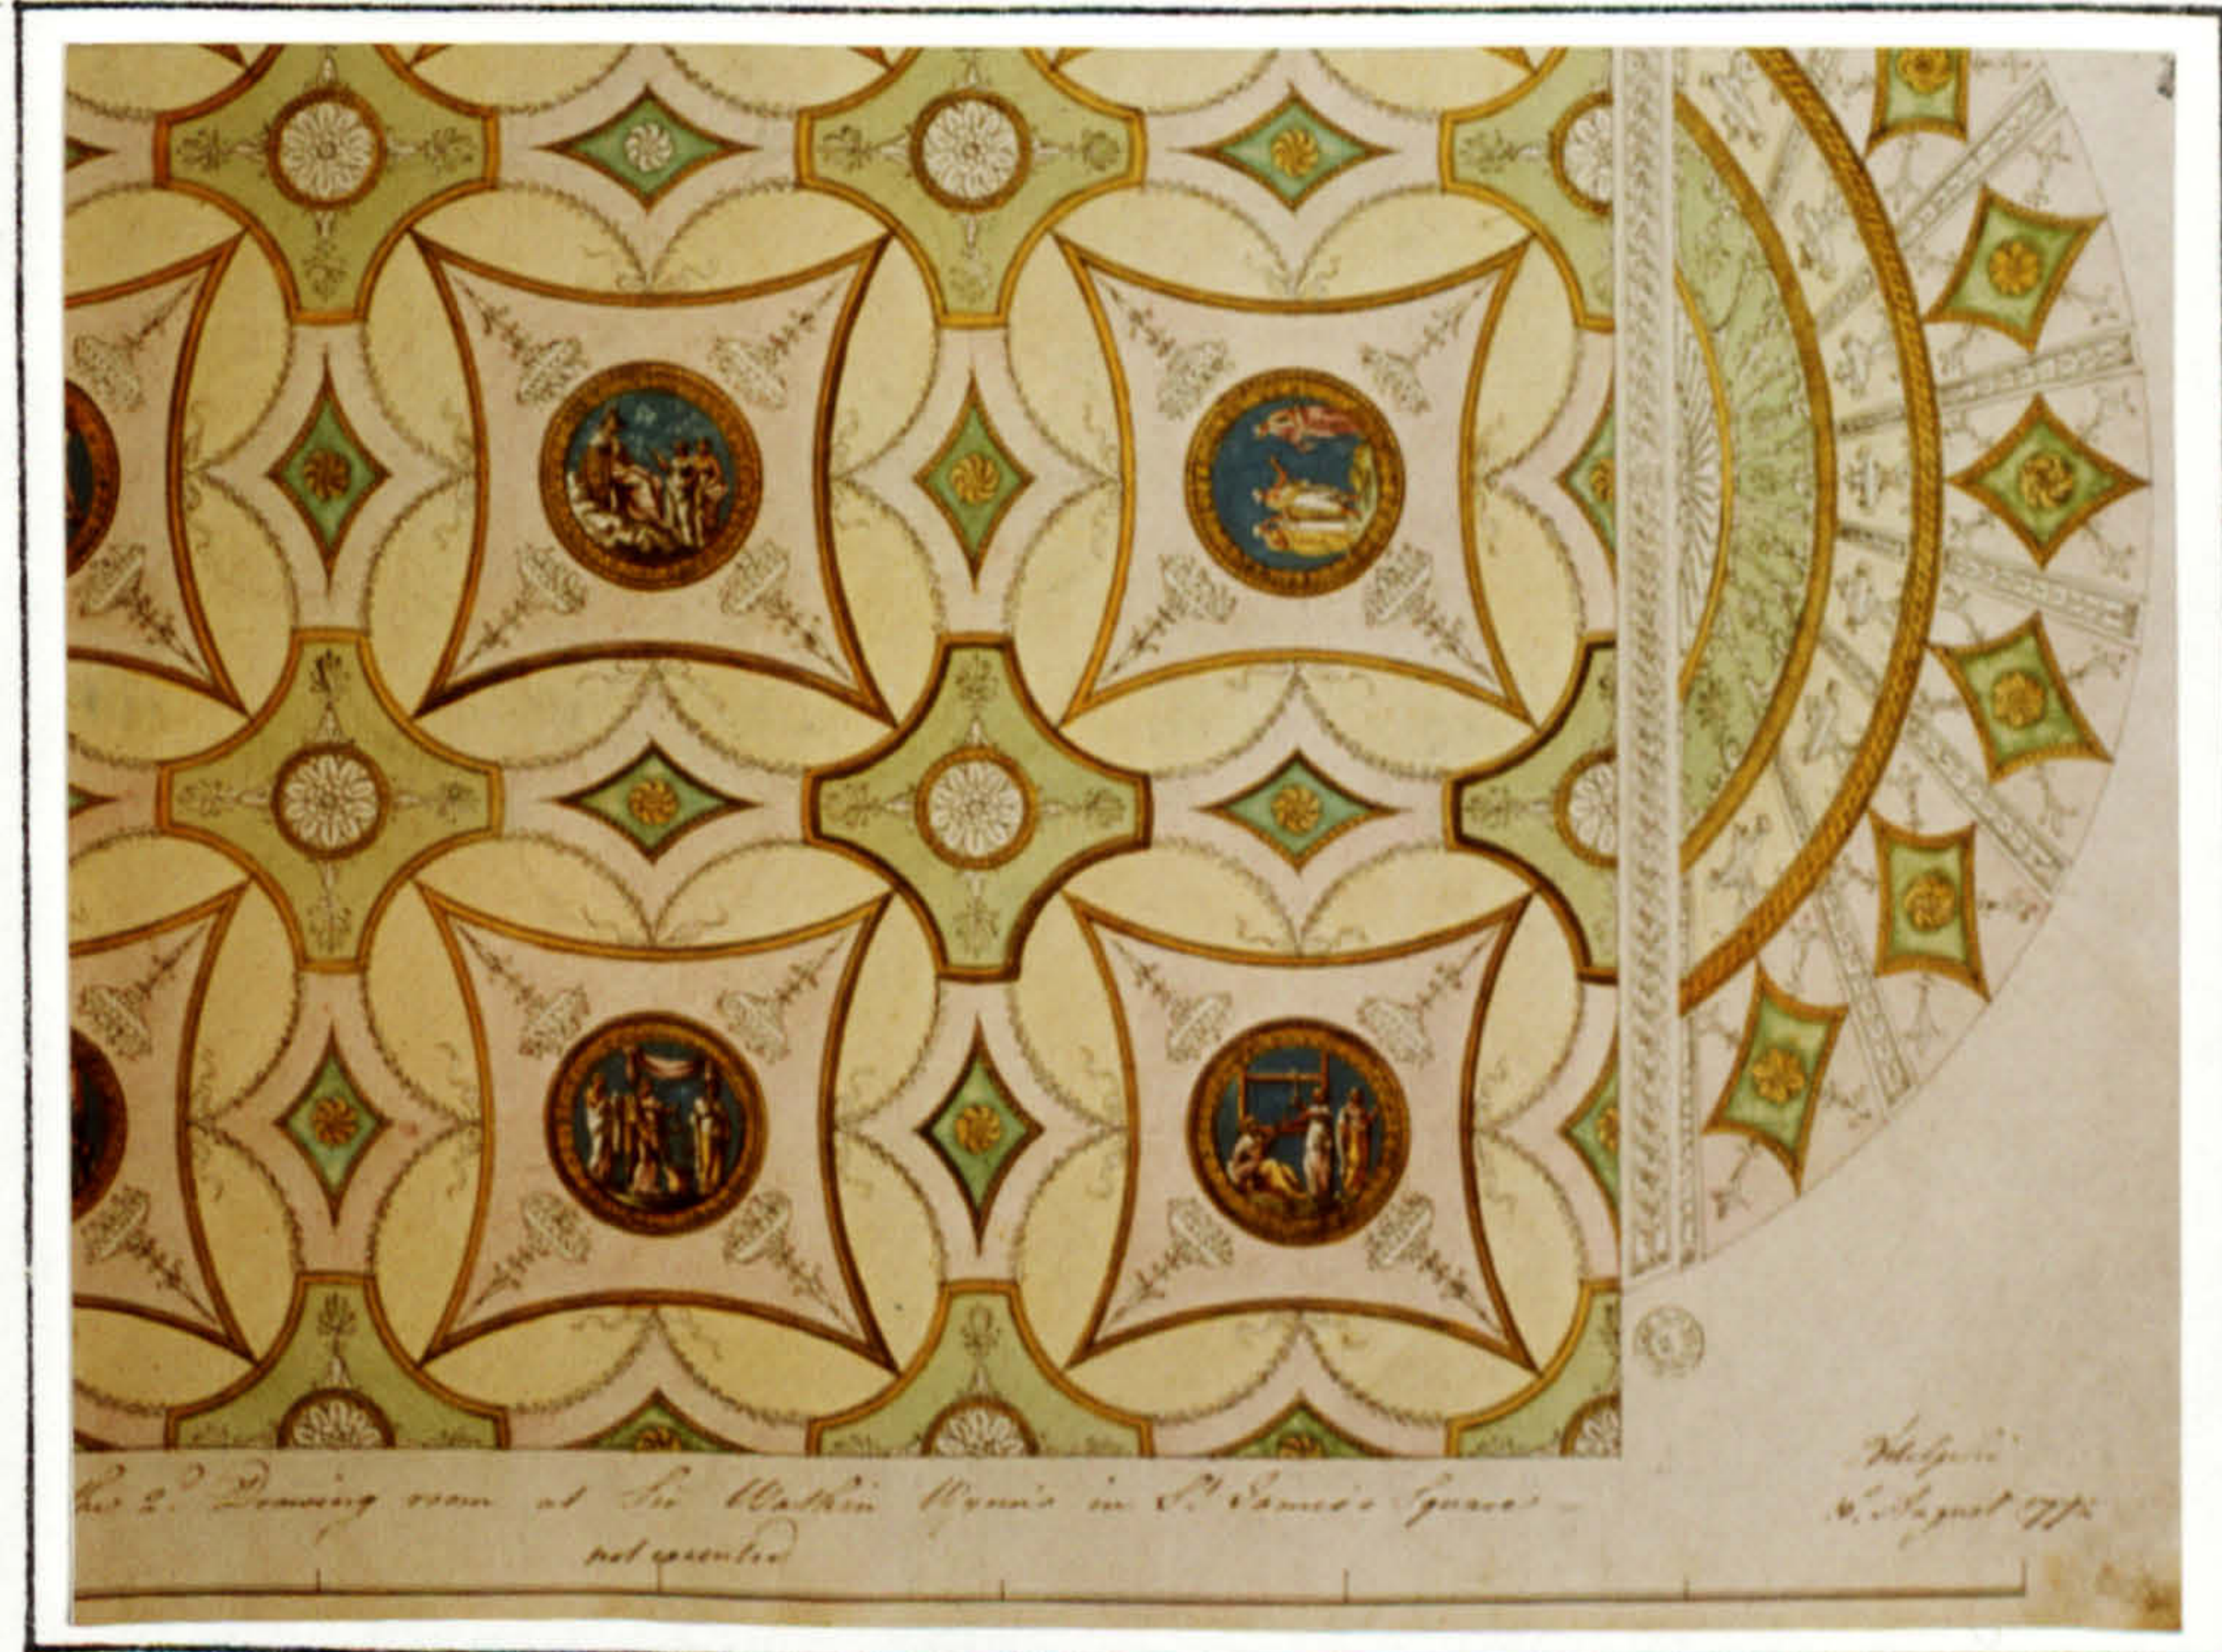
ROBERT ADAM · CEILING FOR SECOND DRAWING ROOM AT 20 ST. JAMES'S SQUARE · 1772
